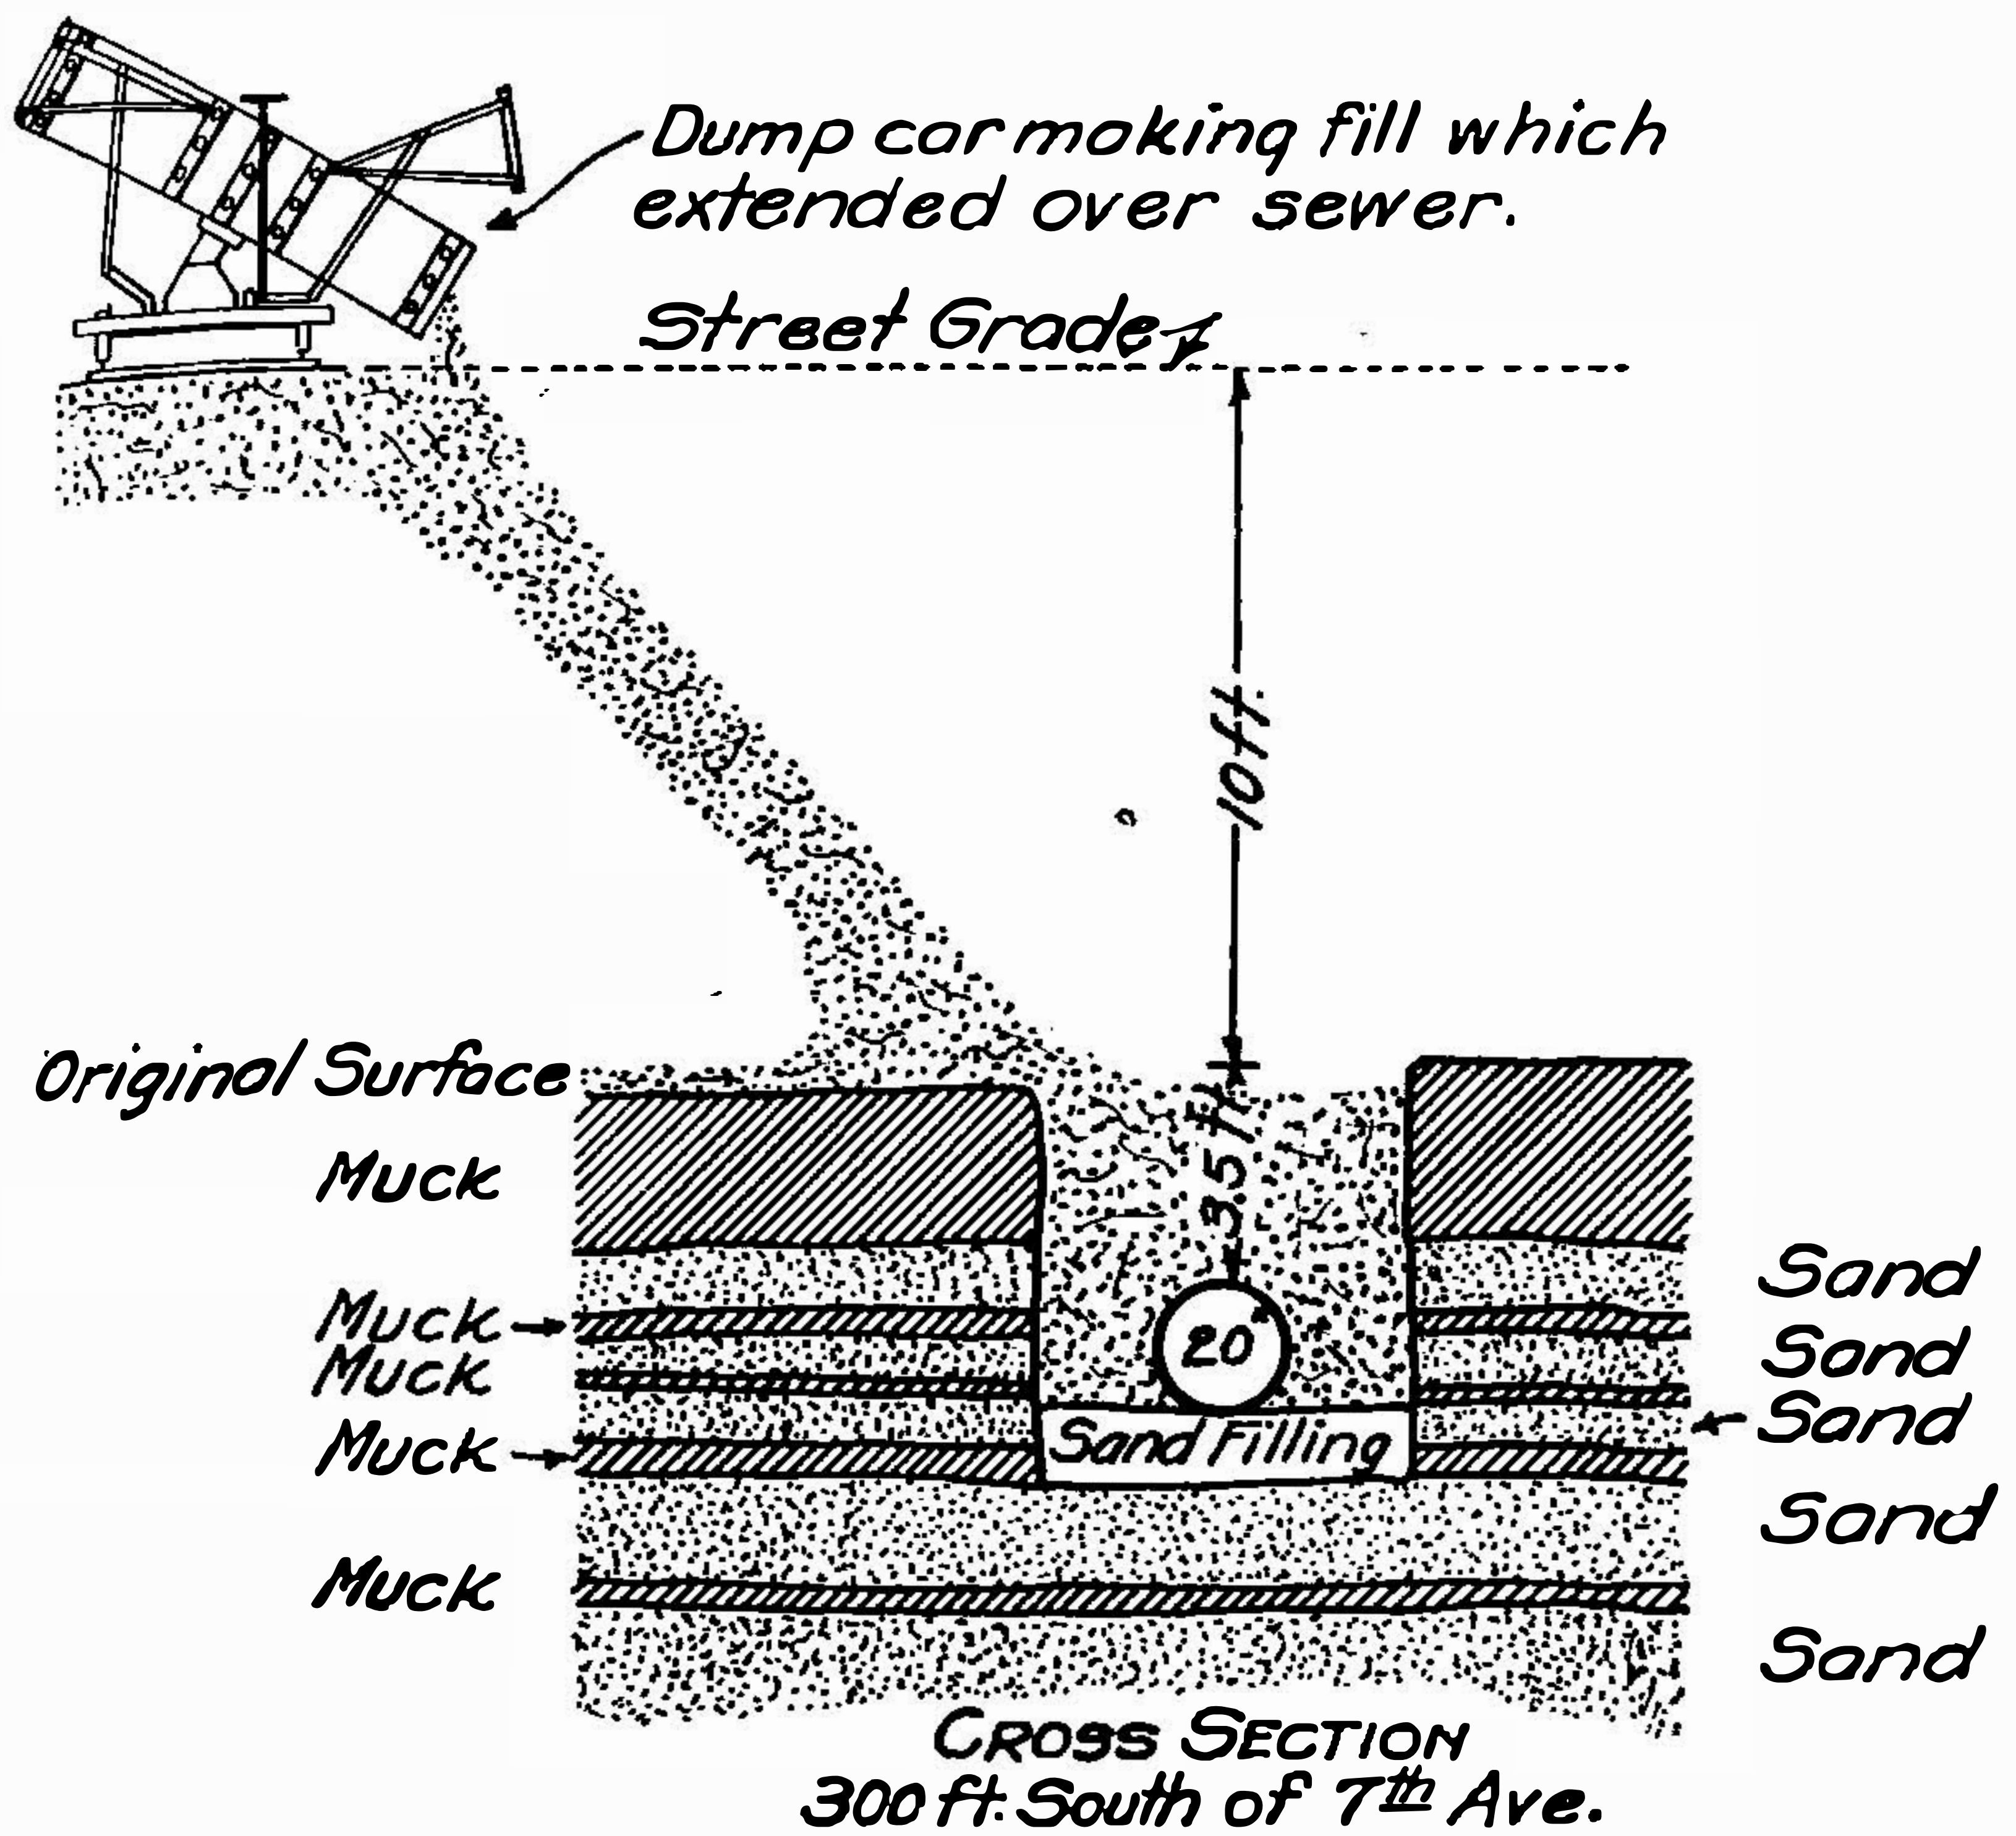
Conditions under which 20 Inch Vitrified Sewer Pipe Cracked in Alley 8, Gary Ind., 1908.
